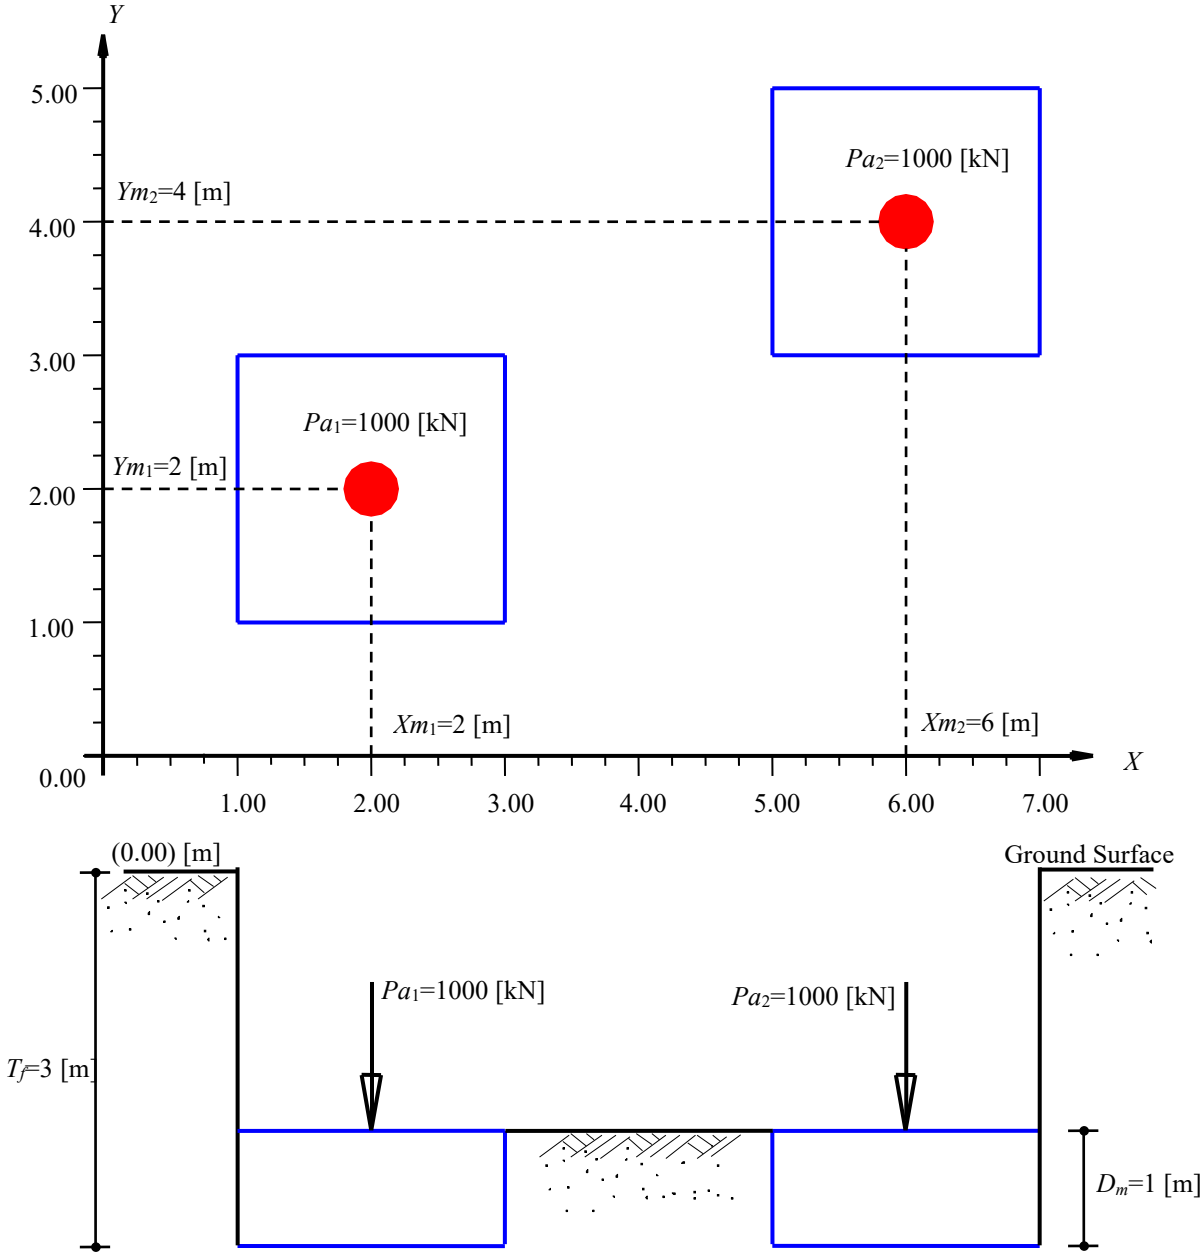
Plan and section through footings 1 and 2 (Arrangement of the footings in the coordinate system)
